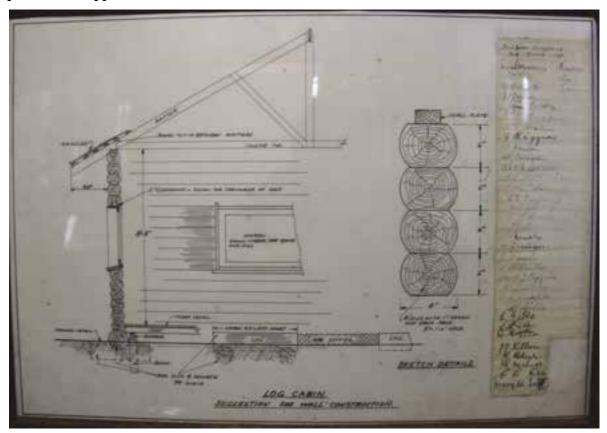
Drawings held at the cabin, showing details of the suggested wall cosntruction.
